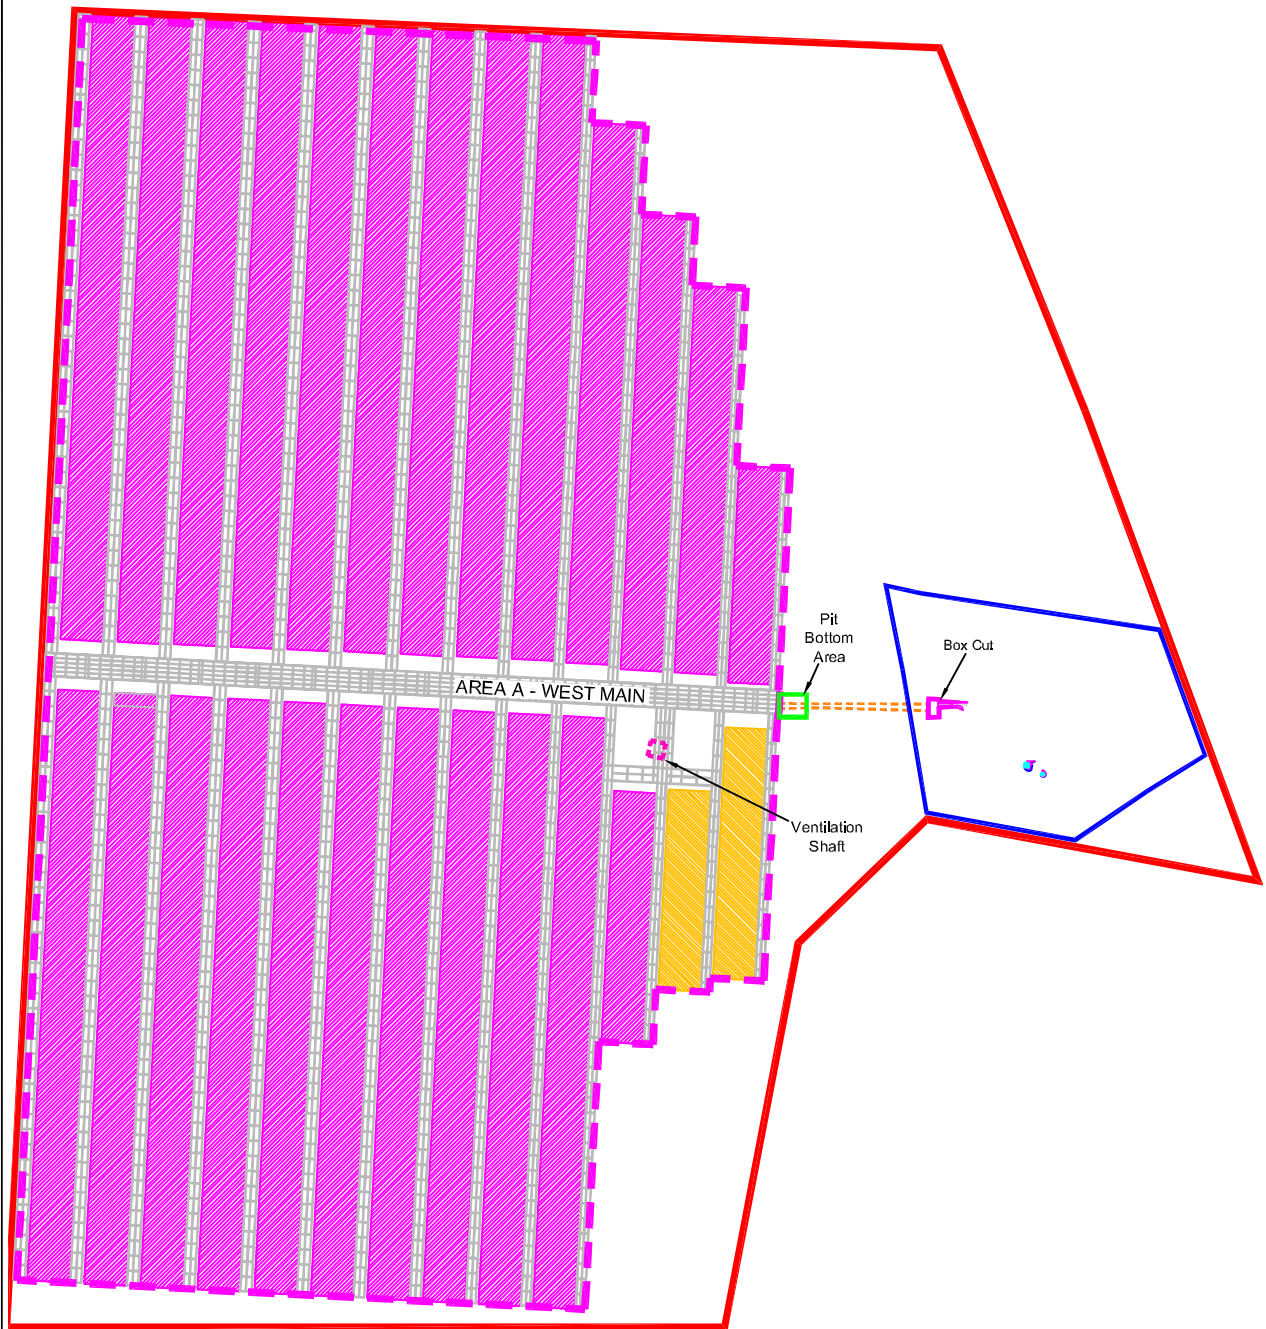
depicts the layout of the mine in the event that it is converted to a longwall mine. Longwall mining operations would be confined to Area C. Mining would involve the sequential development of roadways approximately 300m apart oriented north-south from the West Main and developed for the full distance (approximately 4km) to the northern and southern boundaries of Area C. Once each set of roadways are fully developed, the longwall equipment would be installed and the coal recovered as the longwall unit retreats back towards the West Main between the two roadways. All coal would be conveyed back to the Pit Bottom Area for transfer to the surface via the conveyor drift.
